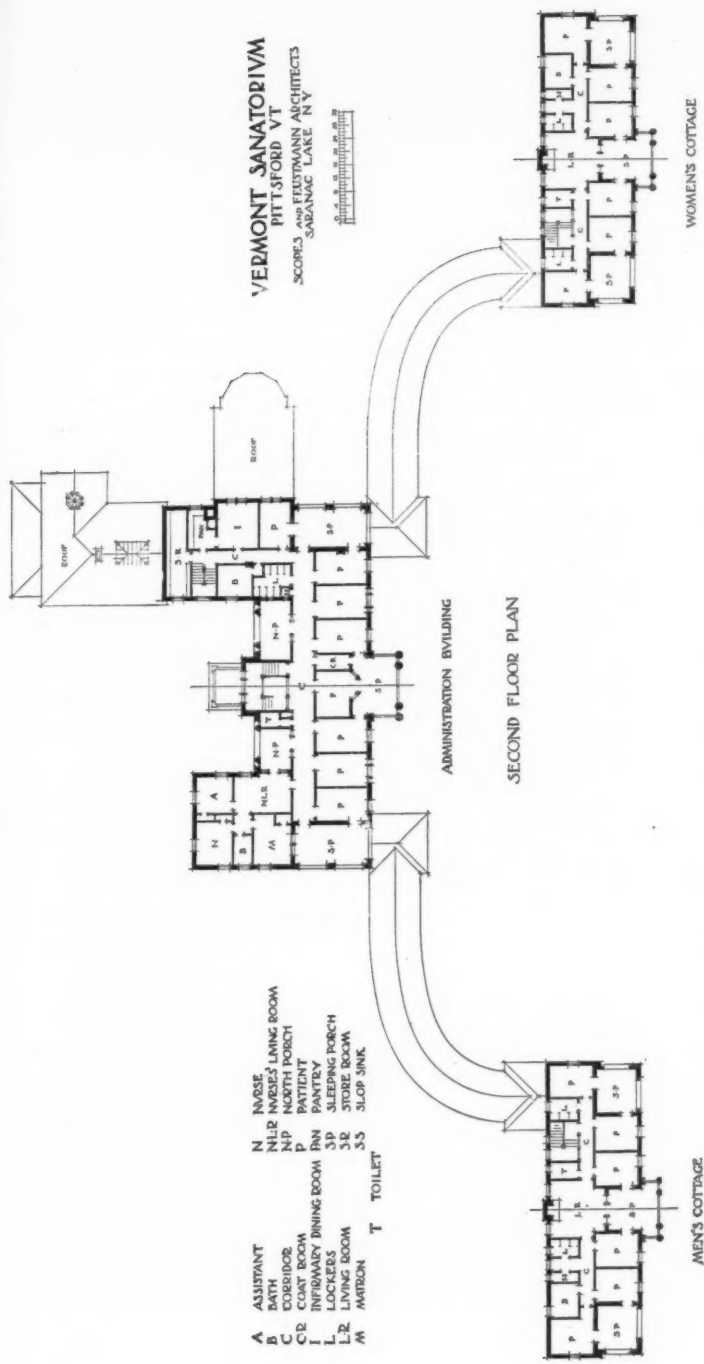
PLAN OF FIRST-FLOOR (SECOND-FLOOR IN U.S.A.) OF VERMONT SANATORIUM.
